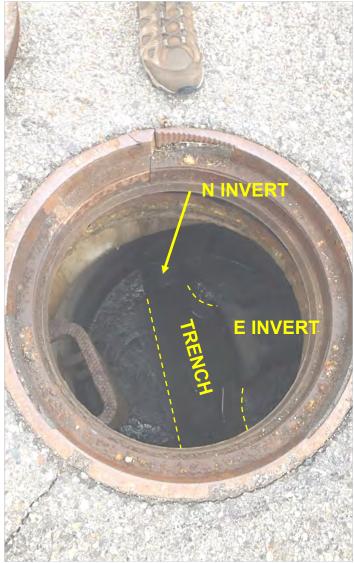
Manhole MH-12 interior with low water level and visible concrete trench & inverts, and trace sediment. View to northwest; photograph taken on April 4, 2022.
